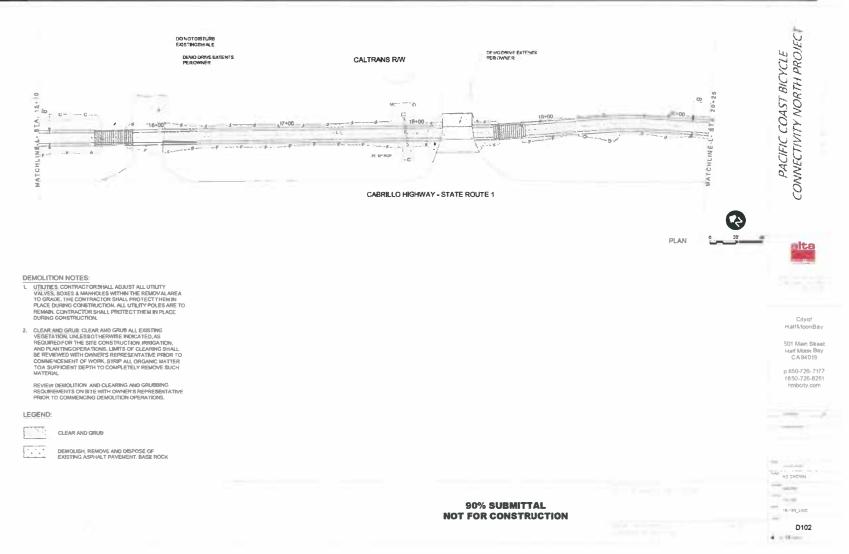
Proposed Project, 90% Plans, Sheet 2 of 3
